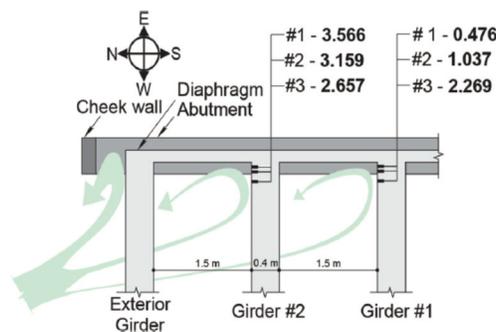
Wind and wave action on bridge girders near the abutment [83]
